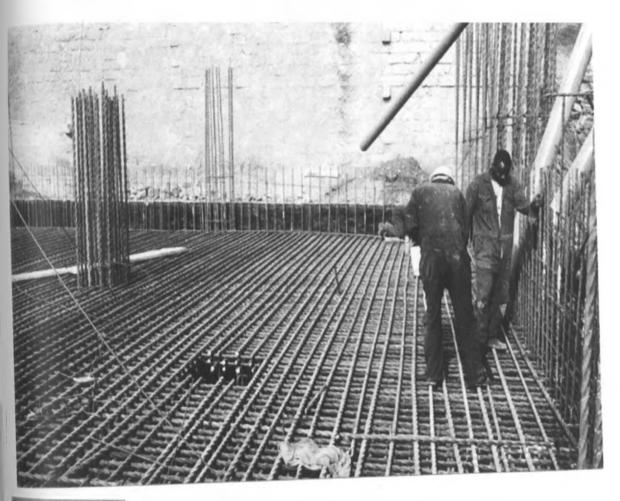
WORKING WITHOUT HEAD PROTECTION GEAR
